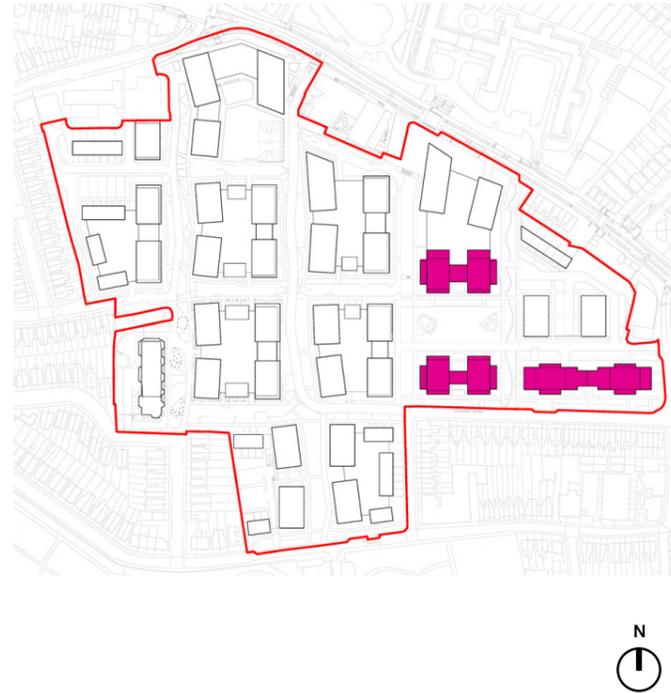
Distribution of Linear Pavilion buildings within the masterplan.
